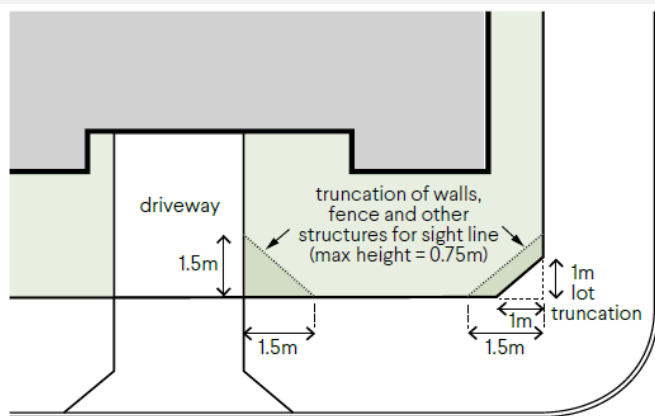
Truncation at street corner to provide sightlines (refer A3.8.7).
